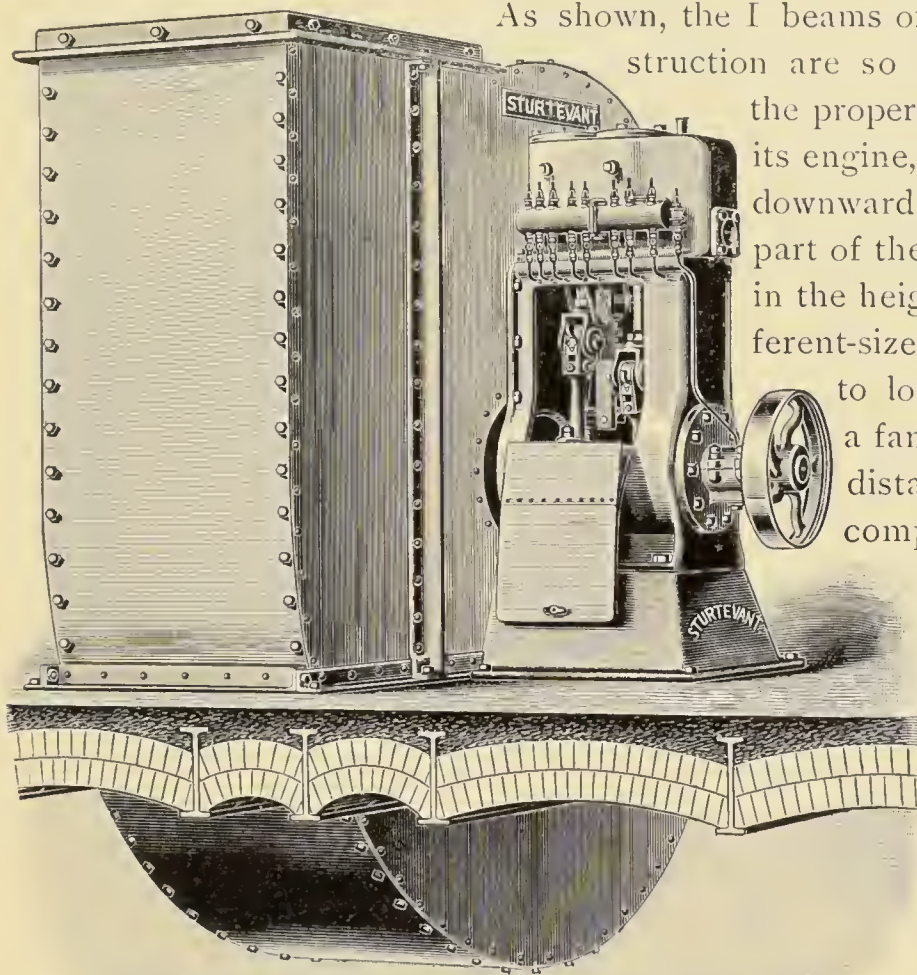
STEEL-PLATE STEAM FAN, THREE-QUARTER-HOUSING TYPE, WITH STEEL-PLATE BOTTOM.
